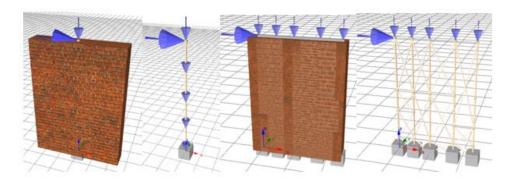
Models of a homogeneous wall and a stone wall-column wall Source: composed by the author
